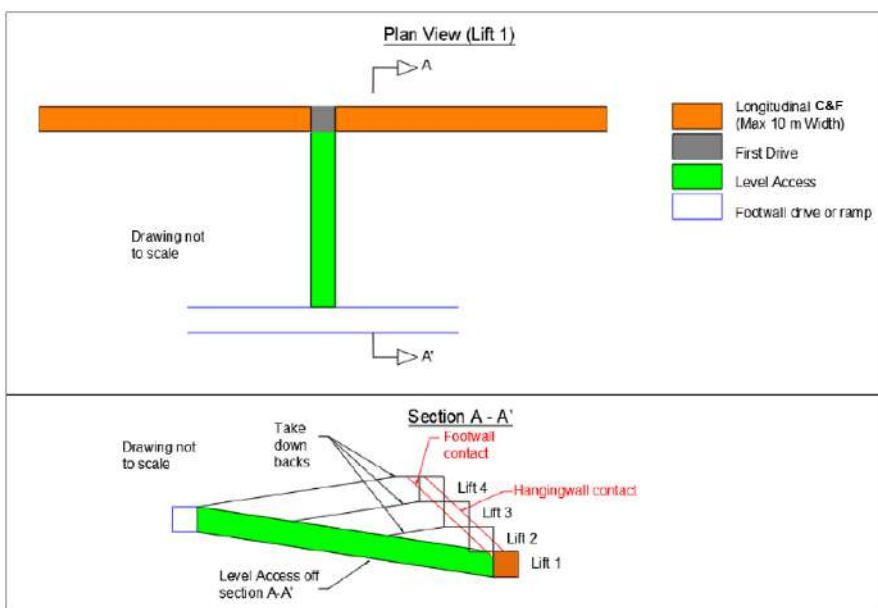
Plan and section view of Longitudinal C&F (Source: Eldorado, 2019)
